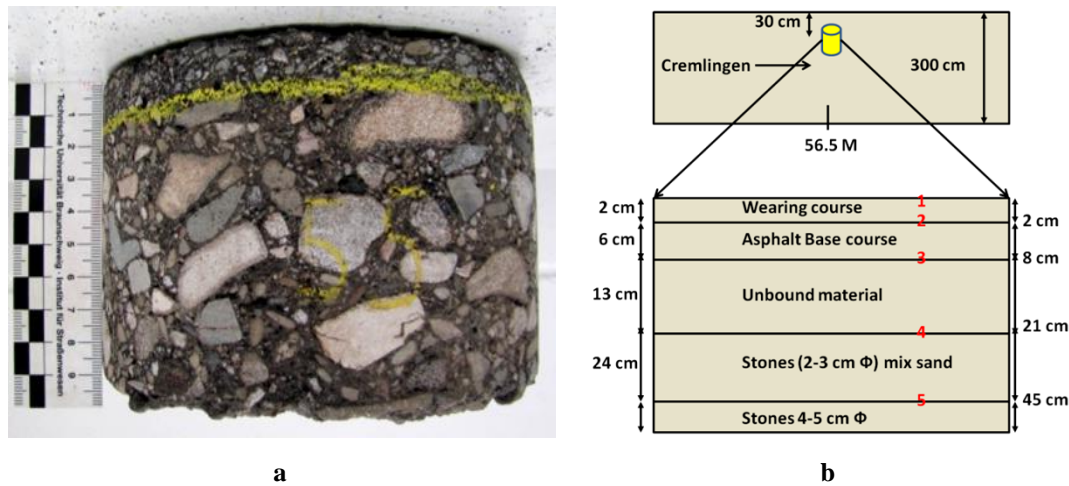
Asphalt pavement construction information at site C on 56 metre location, (a) core sample and, (b) the pavement layers information based on core sample
